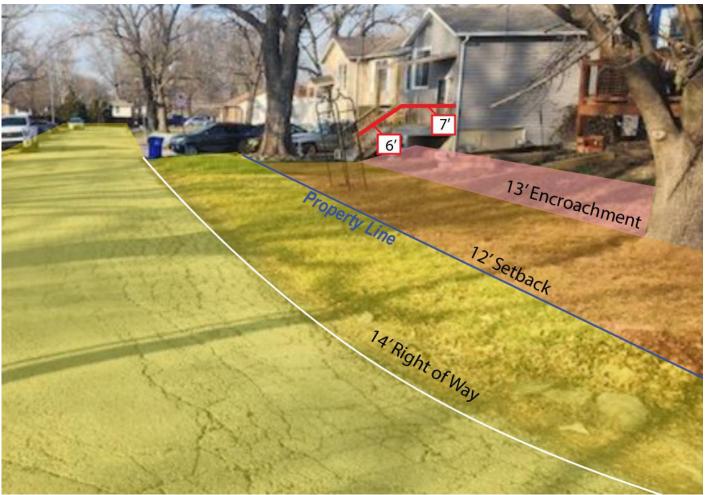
View facing north showing encroachment into setback and dimensions of front porch.
